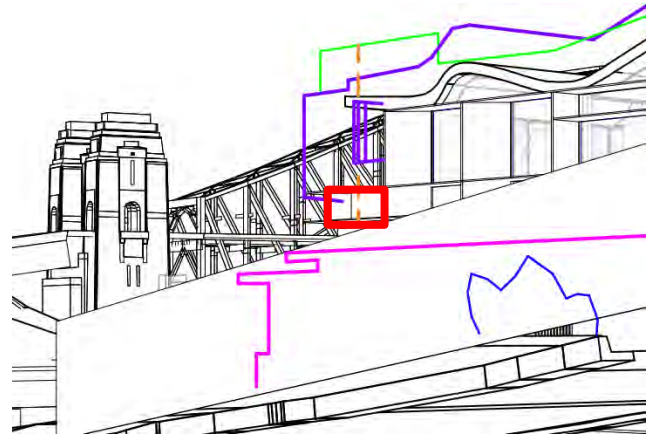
Proposed view from Unit 17/ 21 Waiwera Street
